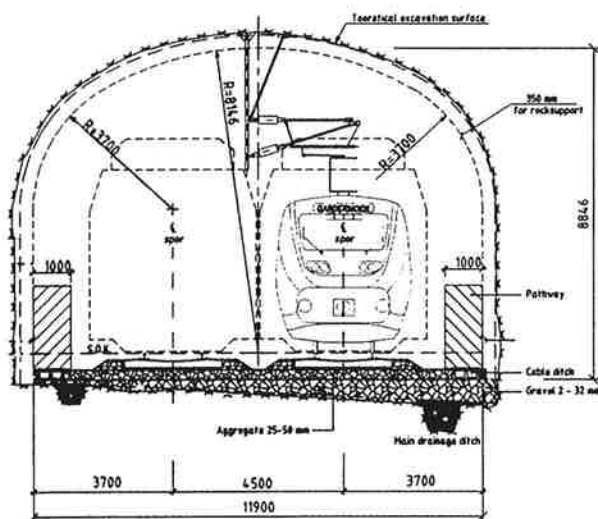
Typical cross section of the Romeriksporten tunnel. From [1]
